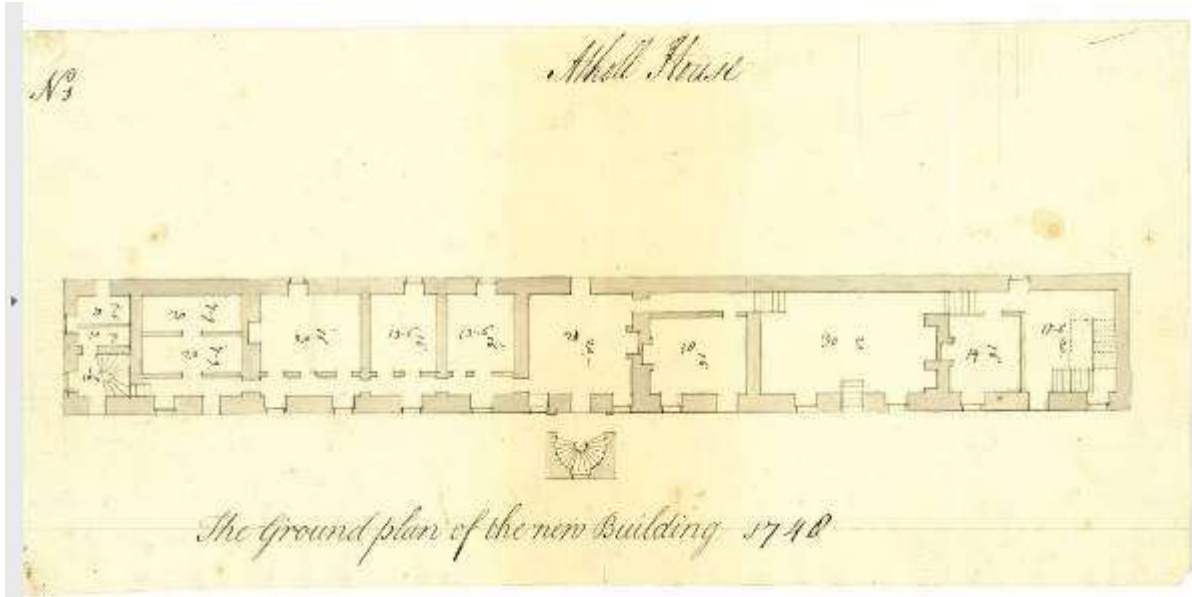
Atholl House Copy of Ground Floor Plan of new building 1740 BCA.
